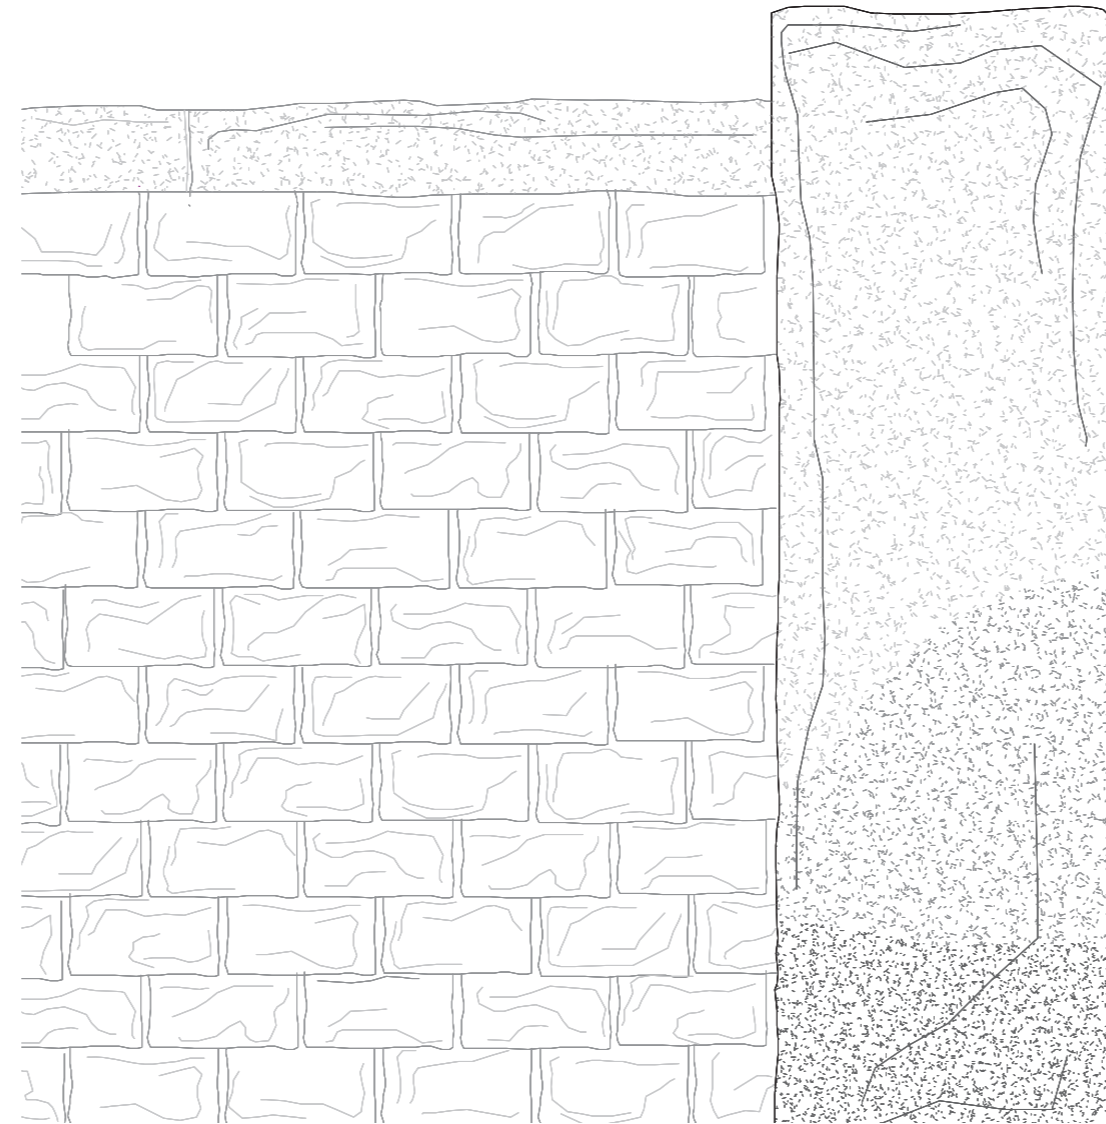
Precast or cast-in-situ concrete Barge (Cap) on Thickened and Raised Gable Wall to prevent material uplift during times of strong wind.
